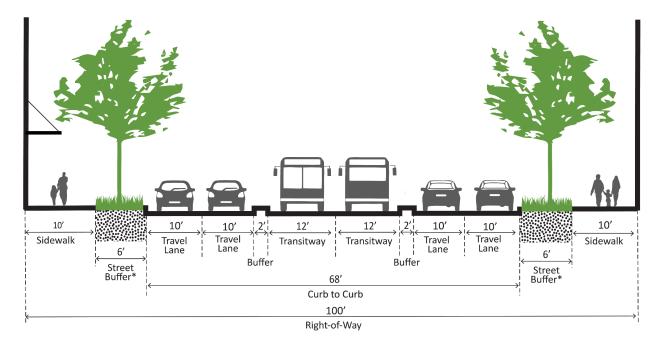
Colesville Road (M-10): South Noyes Drive to Spring Street, Looking North
